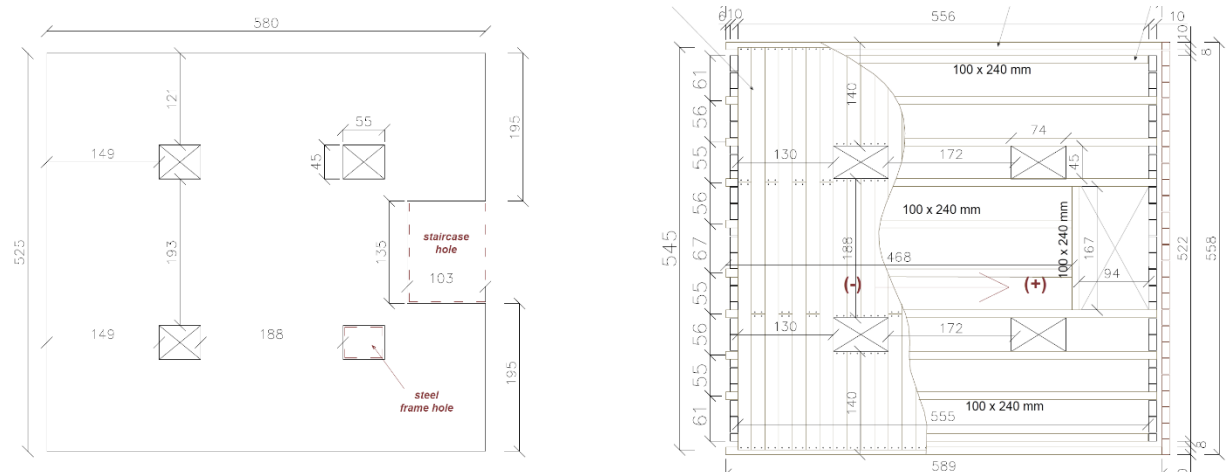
FLOOR PLANS, EUCENTRE EXAMPLES (M. MIGLIETTA, 2019)
